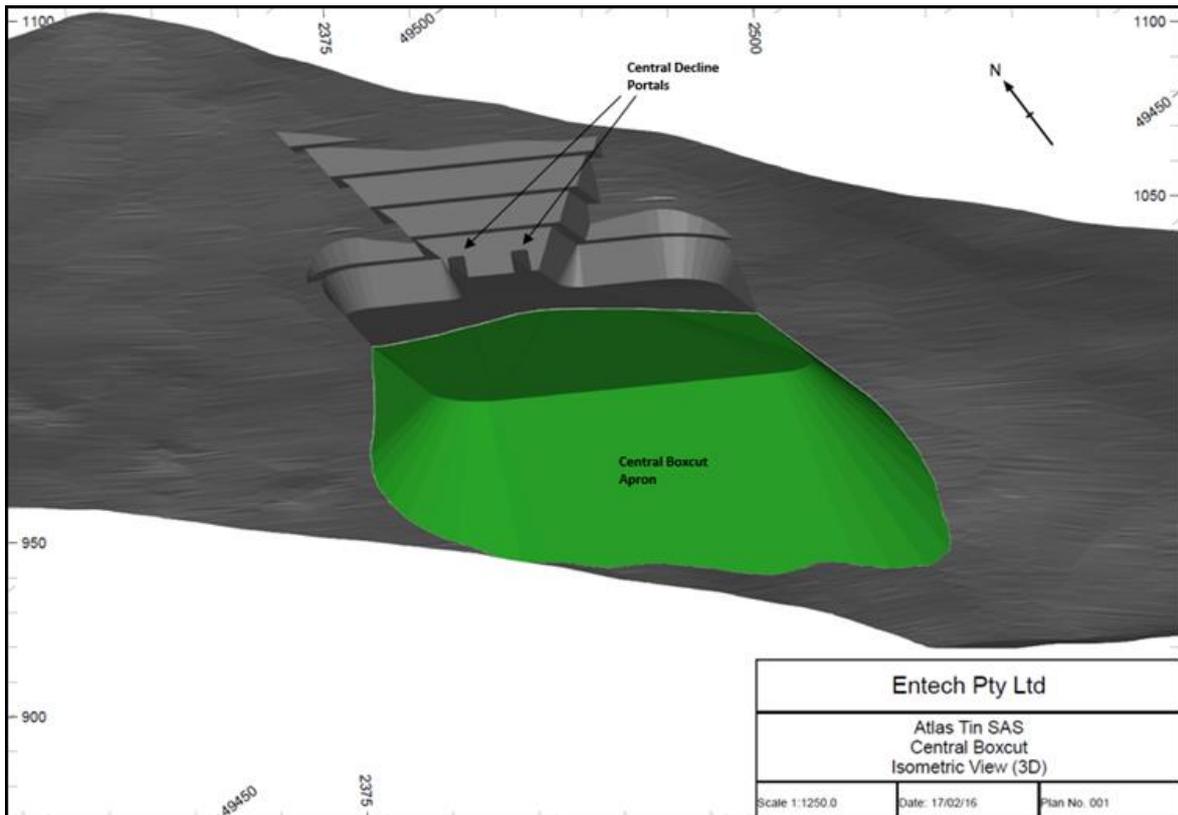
Isometric view of central boxcut and apron (looking NE)
